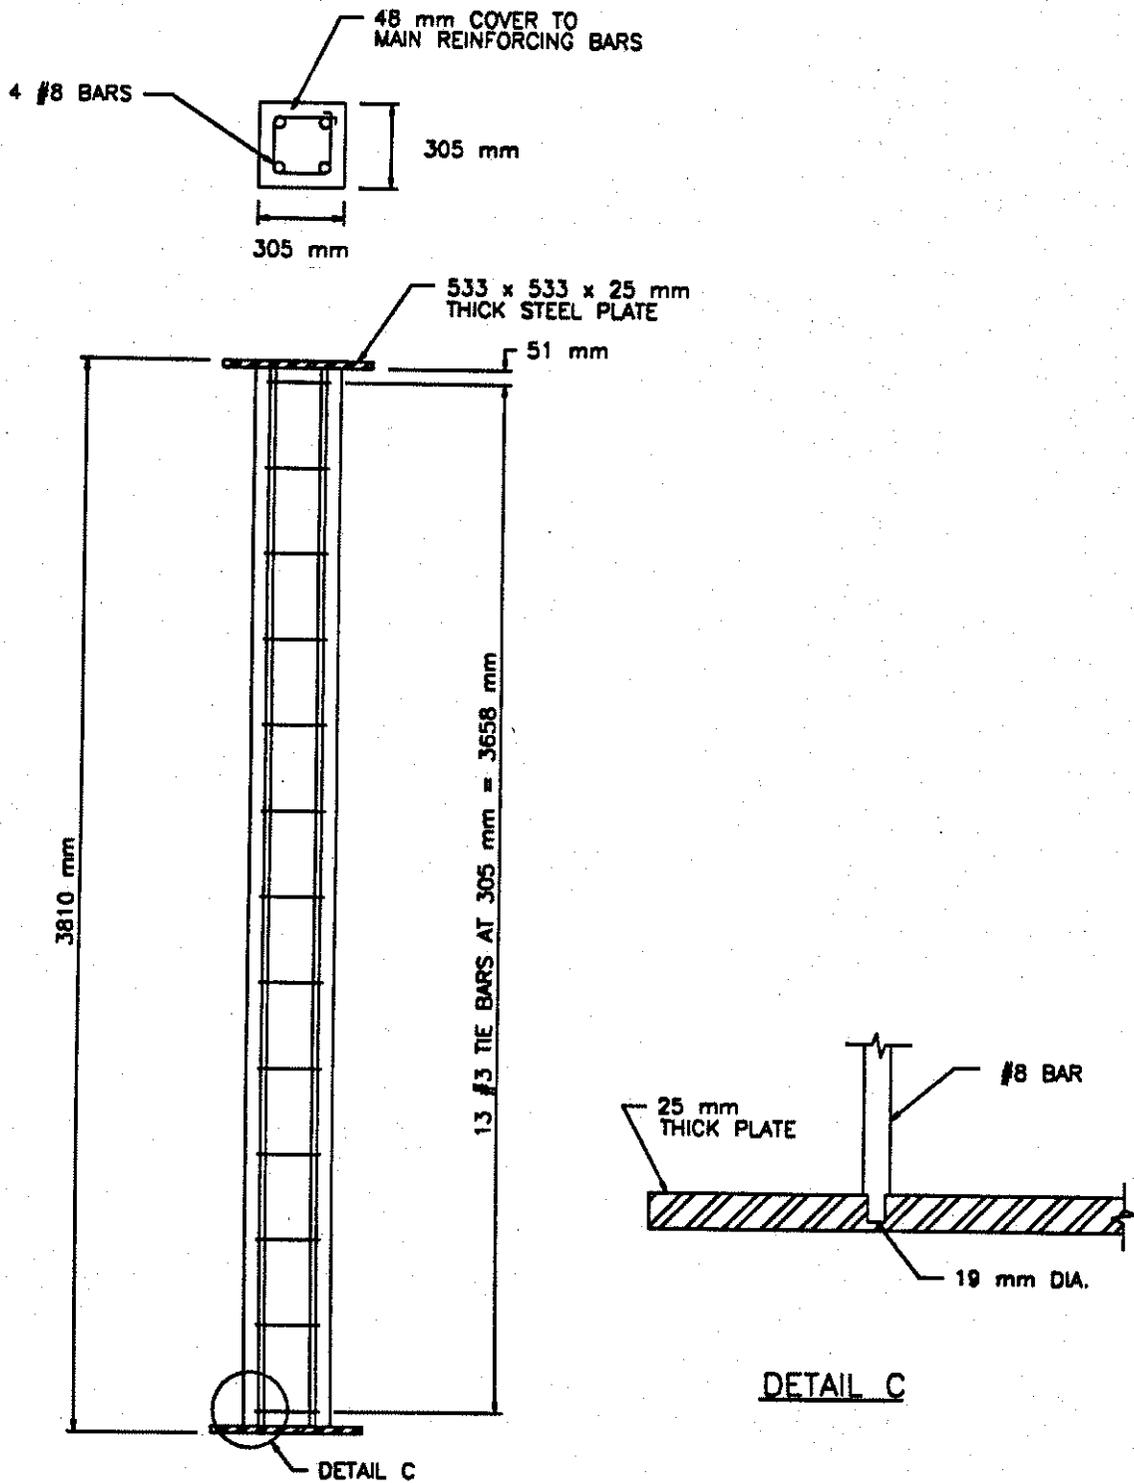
ELEVATION, CROSS-SECTION AND FINISHING DETAIL:
